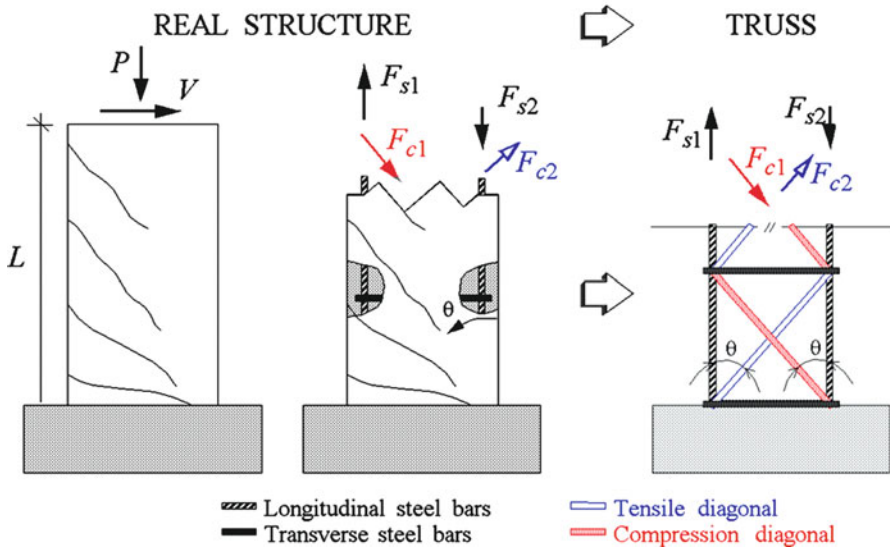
Truss analogy for a cantilever beam under significant shear forces
